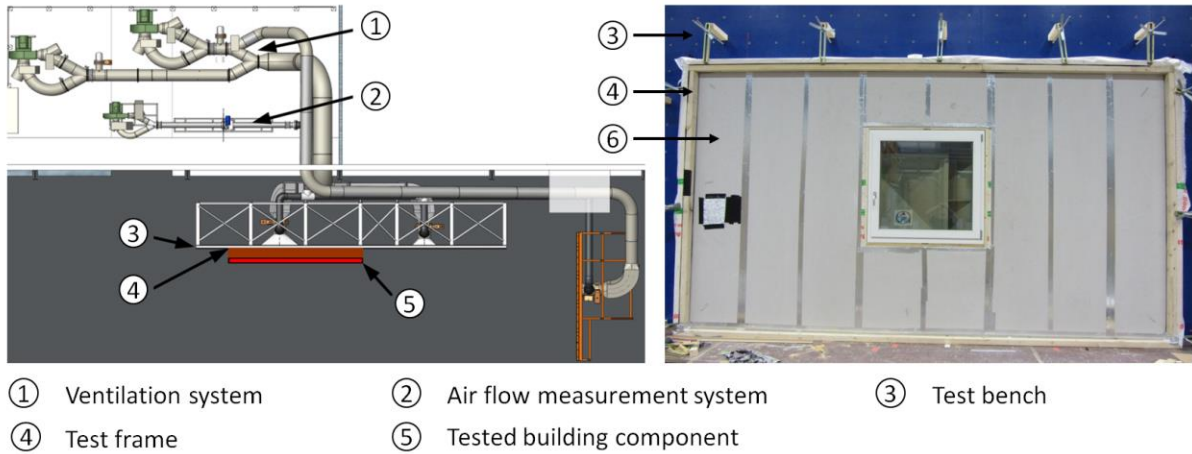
Big scale set up - AEV test bench (left) and the real scale wall assembly tested (right)
